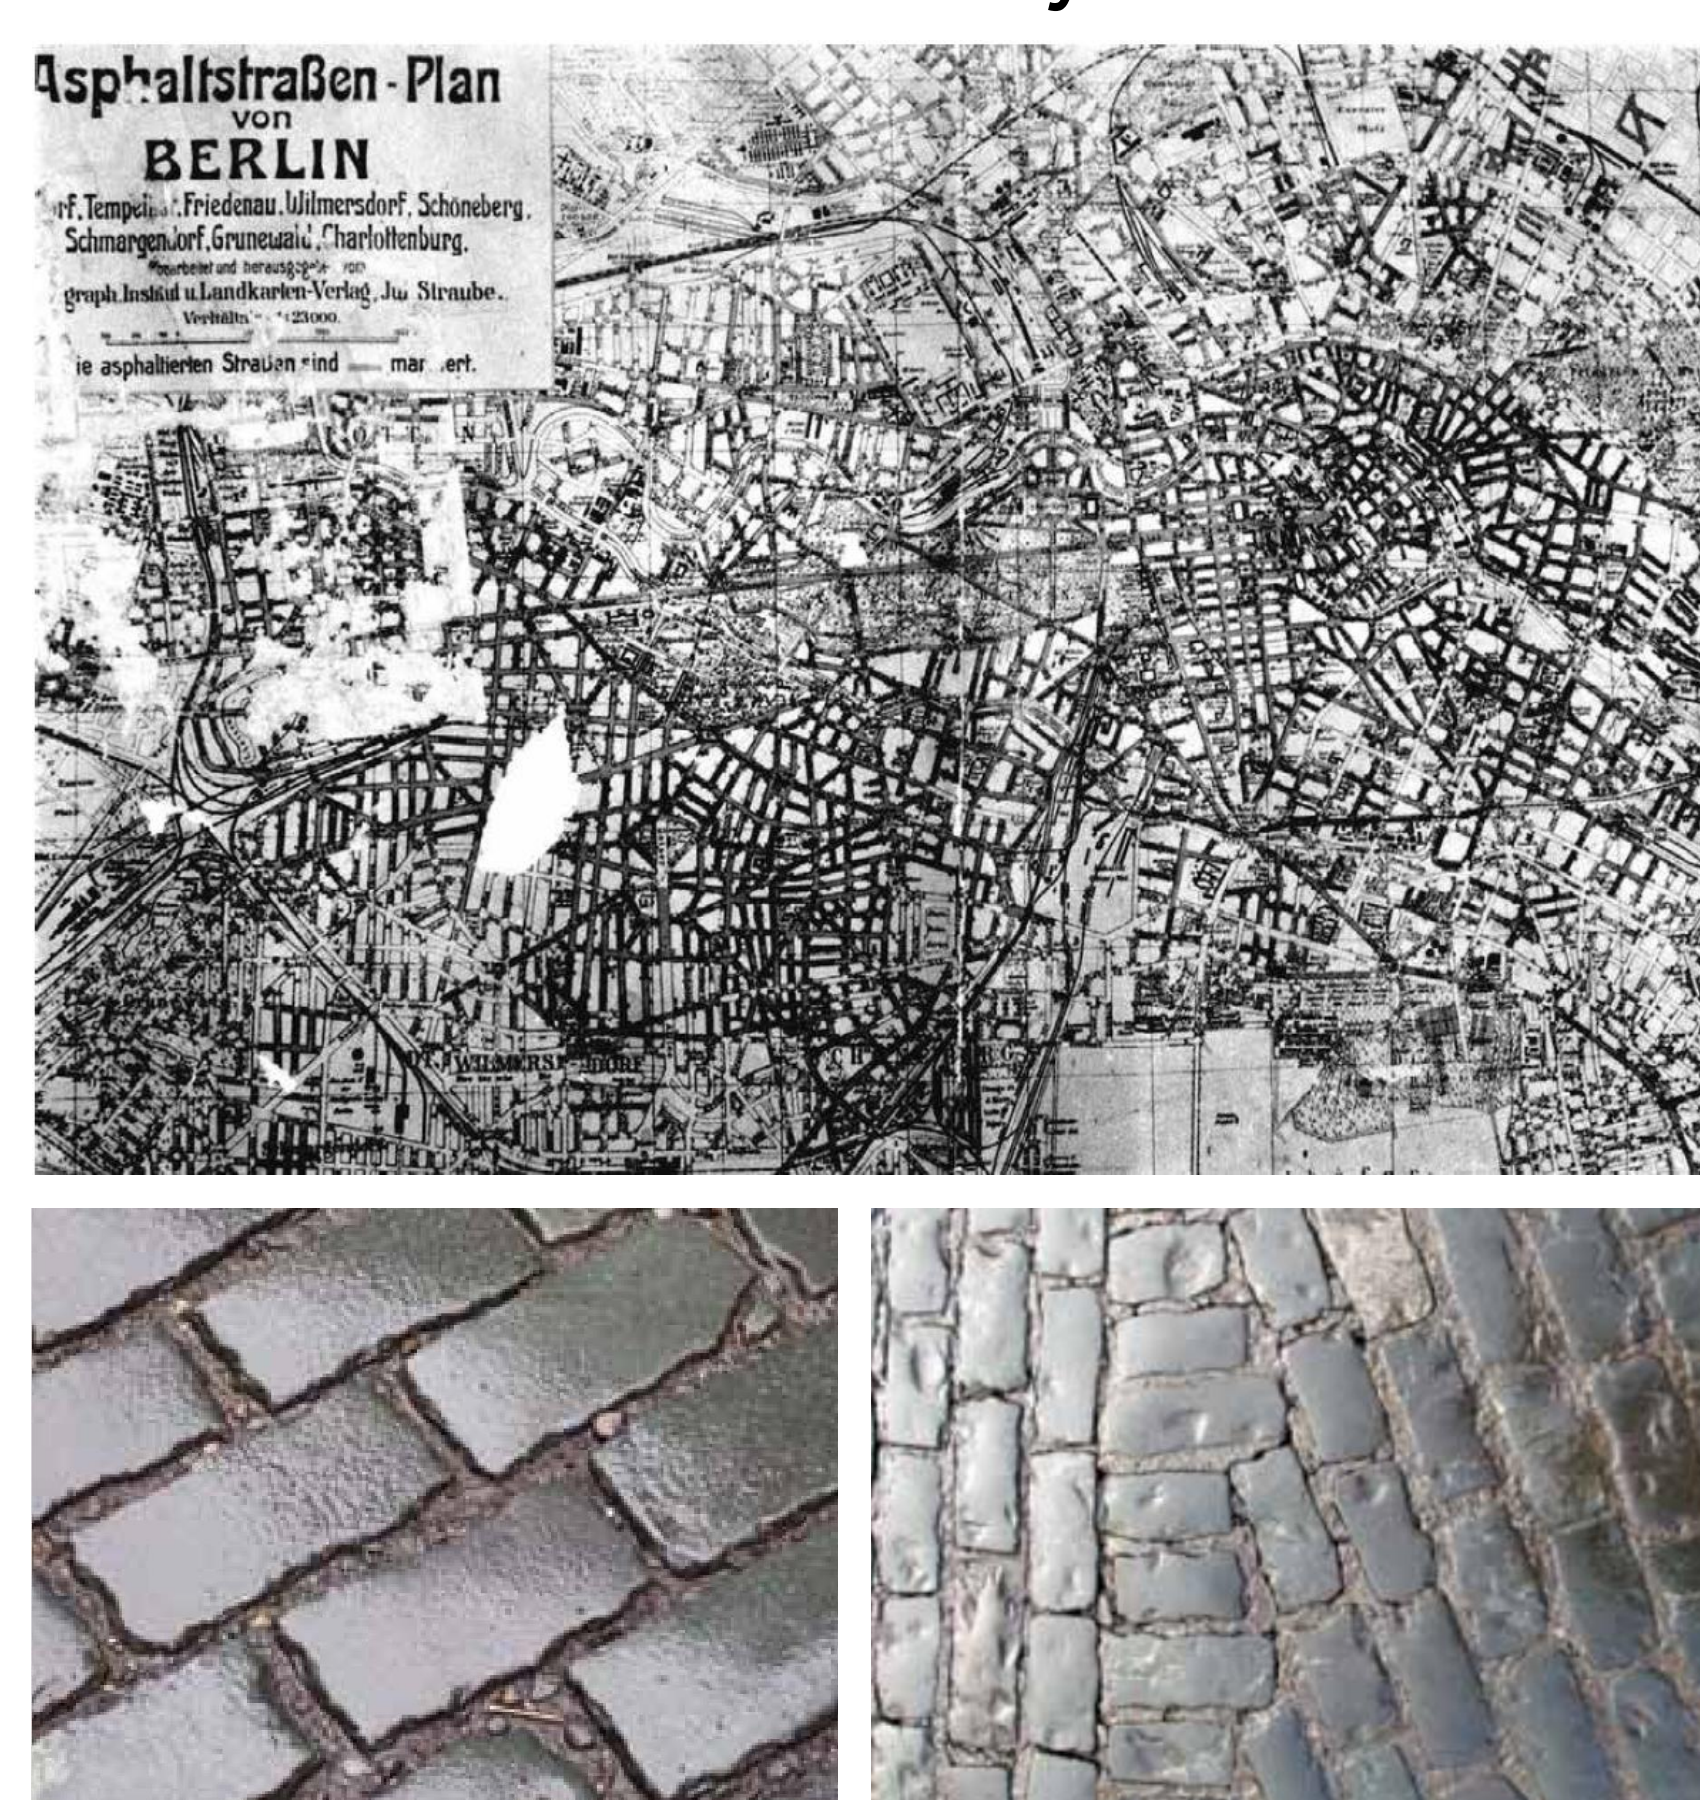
Berlin paving project and examples of pitch stone paved roads.
